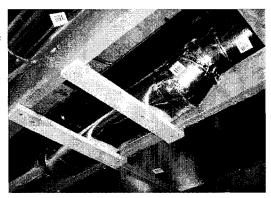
,006.jpg</u>, shows a complicated take-off arrangement at the end of the supply-air trunk. The contractor was challenged to avoid both framing and plumbing. The branch with the top take-off travels between the floor joist, but elbows were required to avoid a water pipe which is shown making its own connection up through the frame floor.
